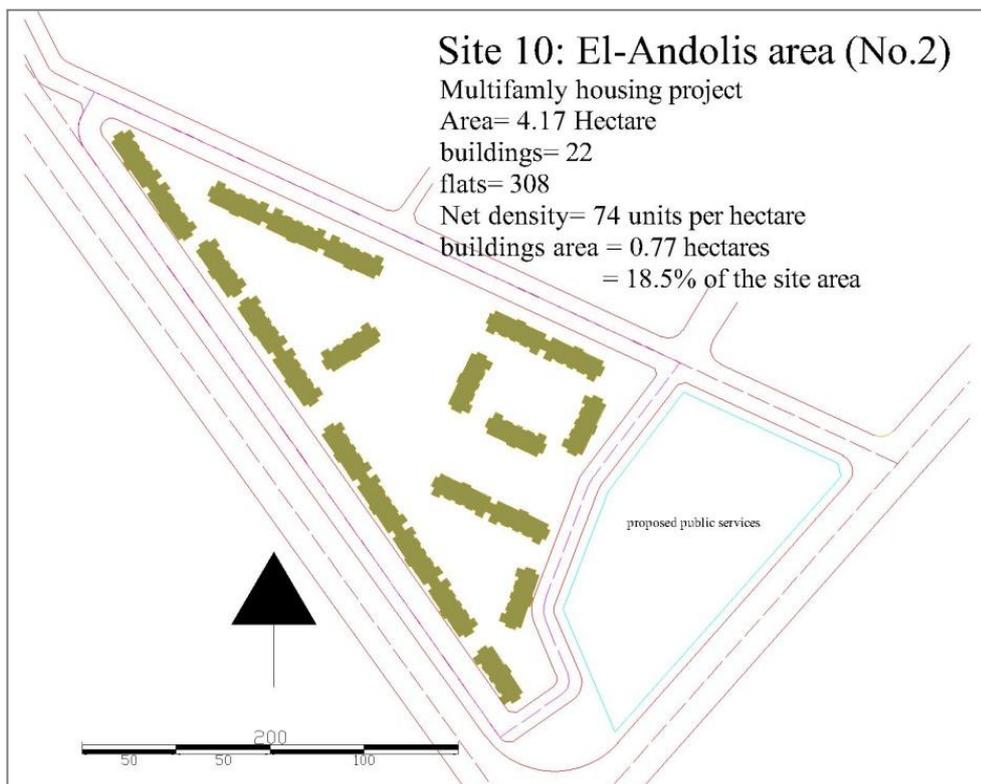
32: Layout Plan, Site Ten – El-Andolis-II Area
